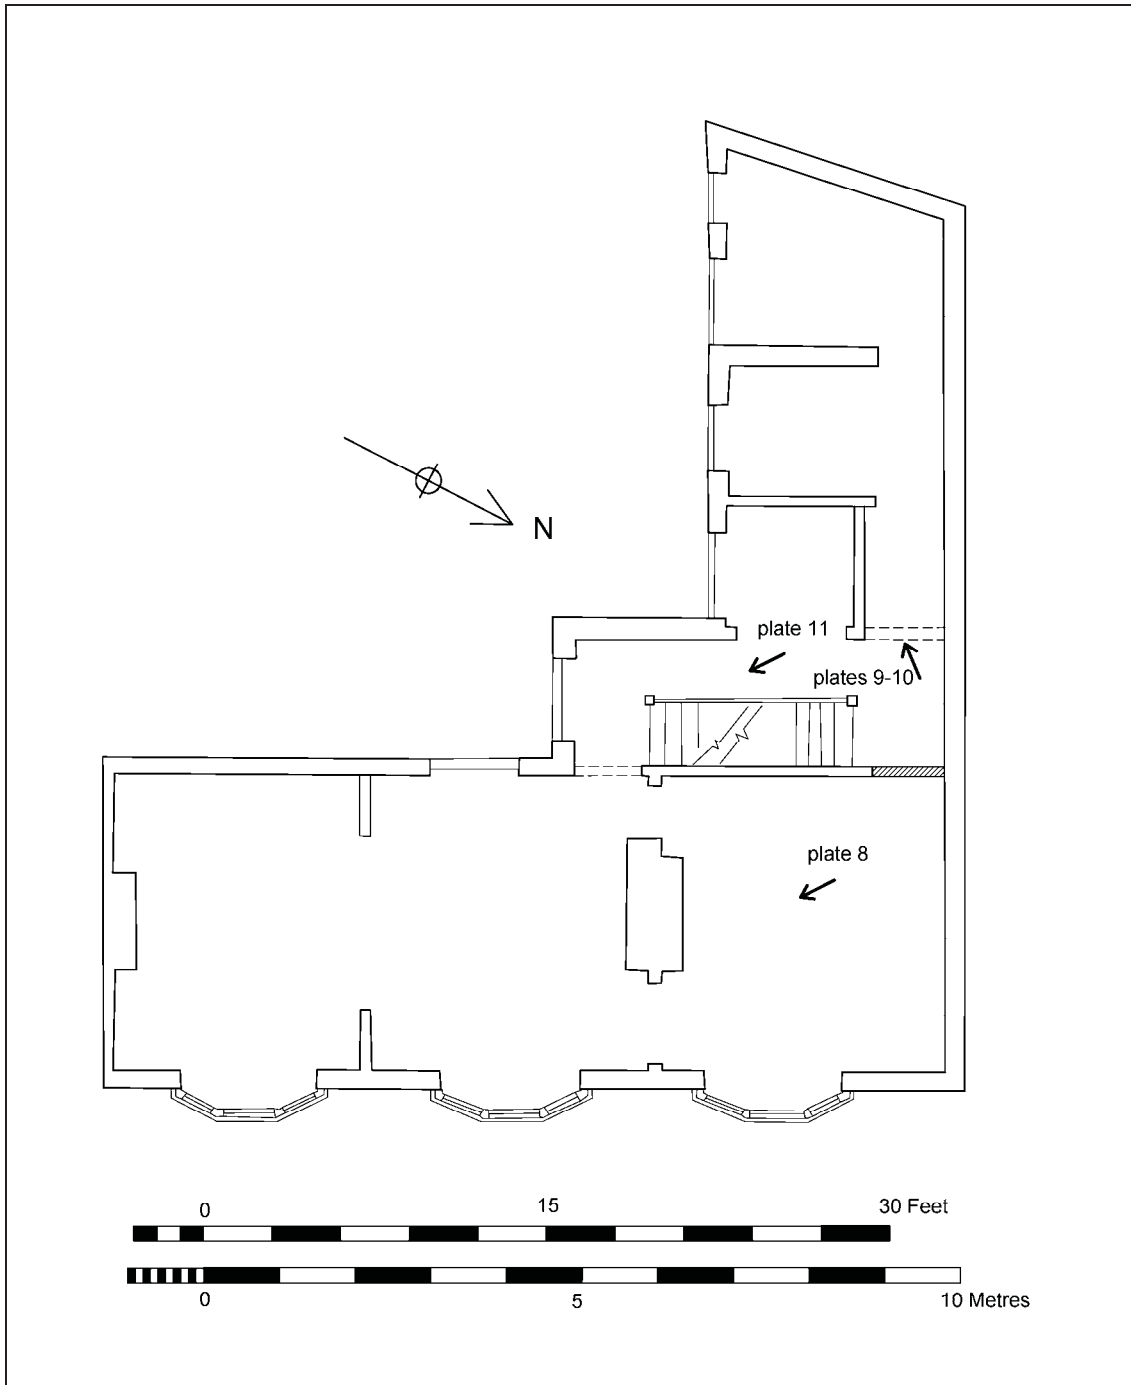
No. 4 Northgate Street, first floor plan, with locations of plates added.
